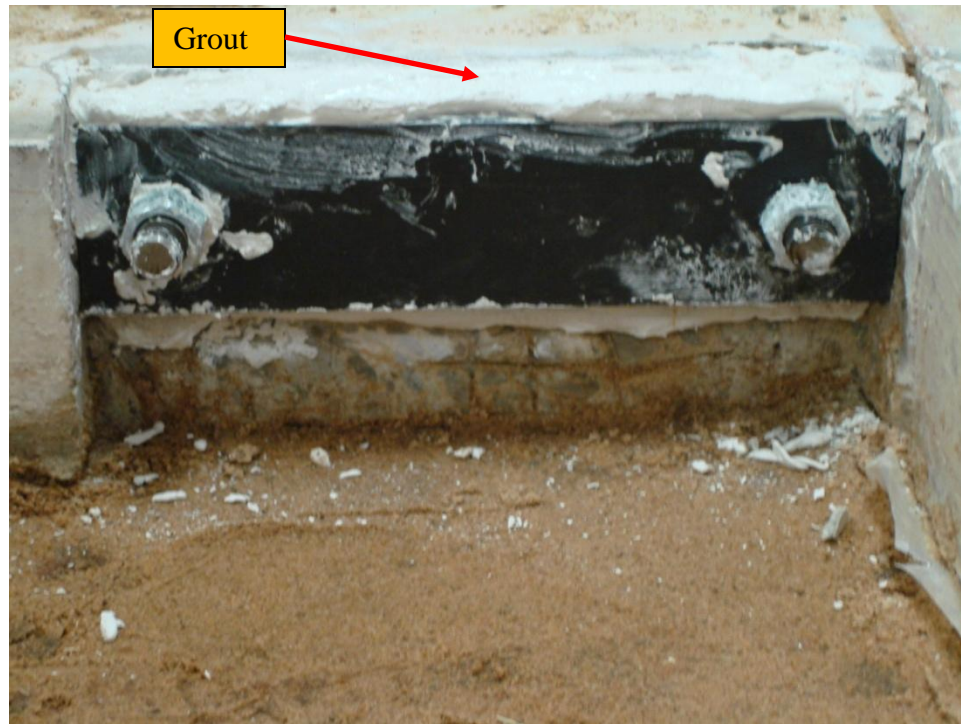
Steel trusses are placed at both ends of slab specimens
